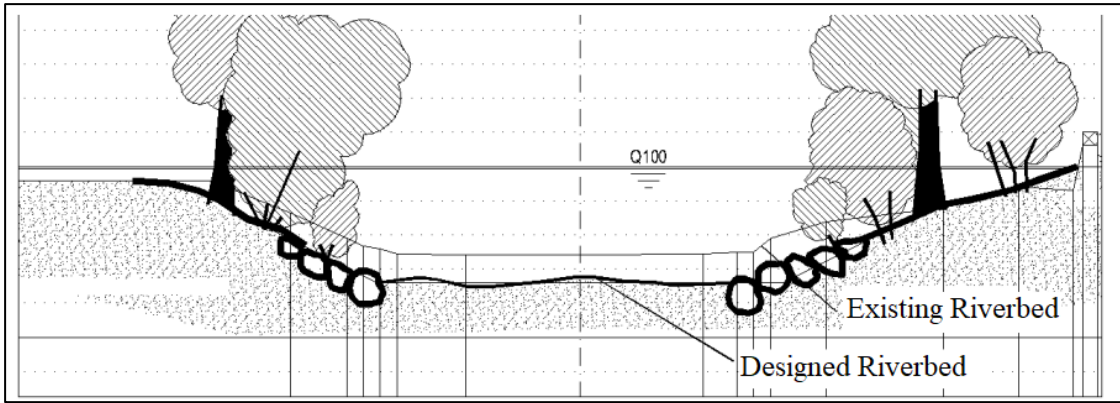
Typical cross-section between Alpes Dam and Domel [38]
